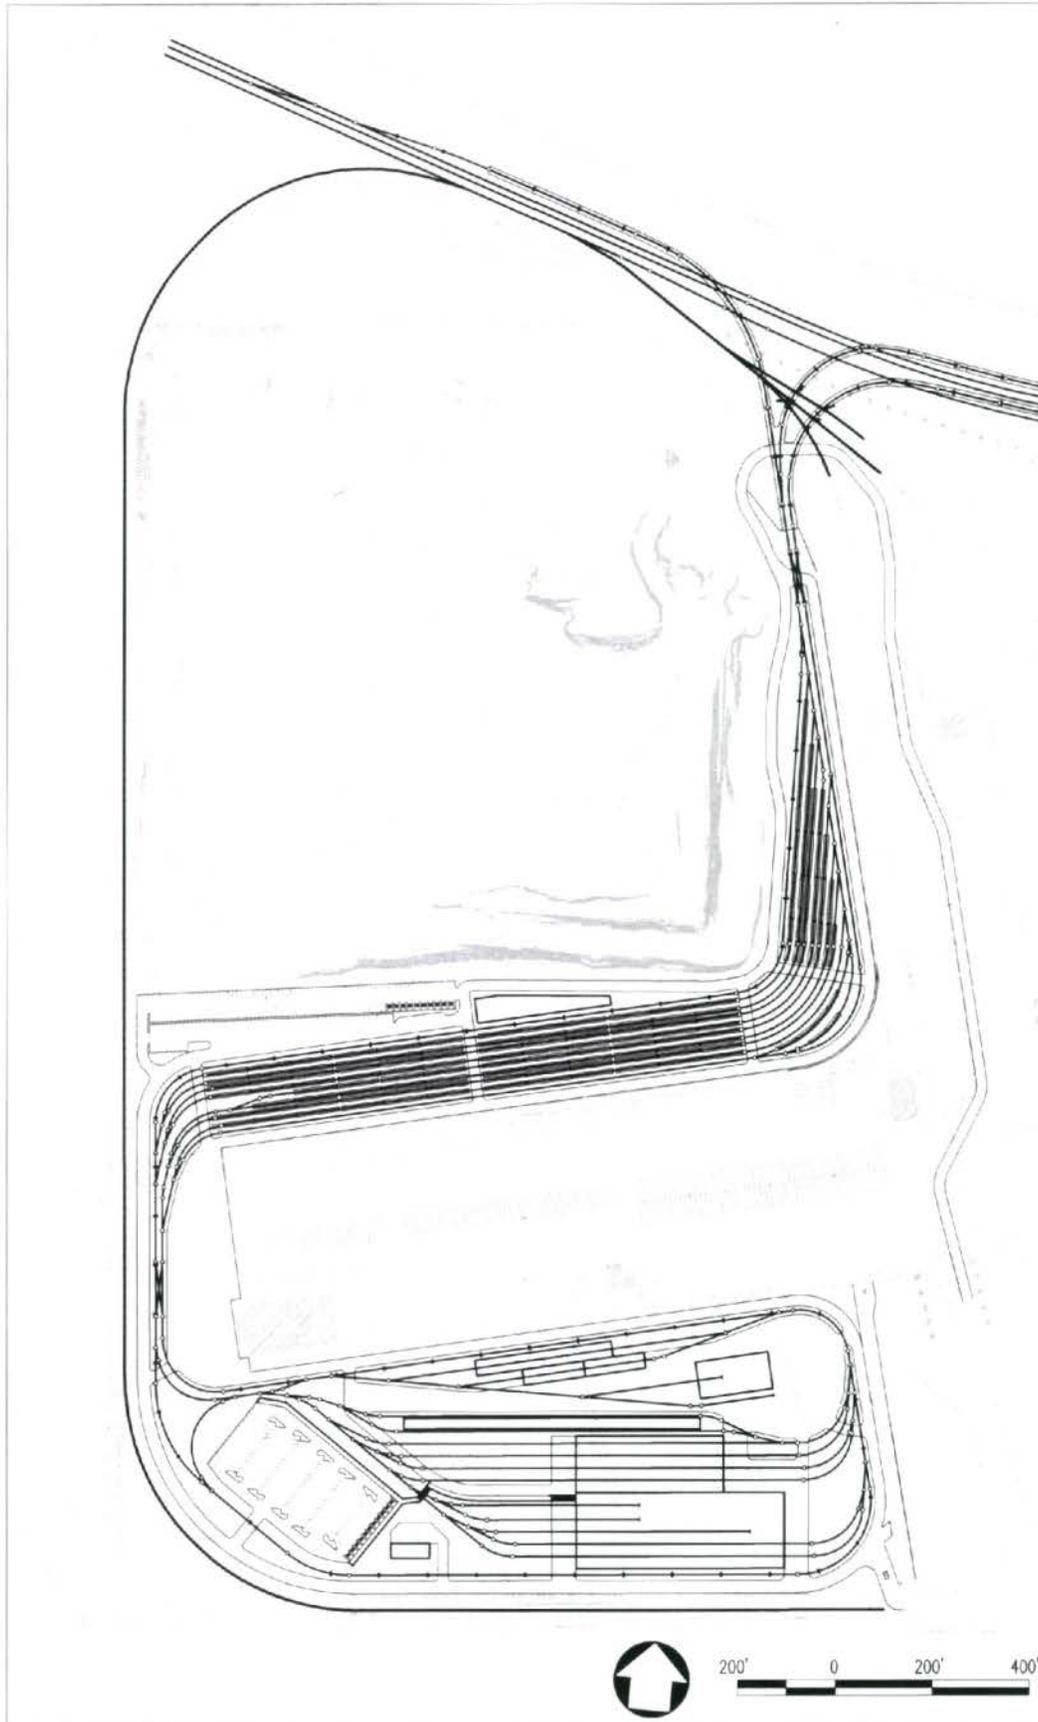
Site Plan: Maintenance and Operations Facility, Irwindale
